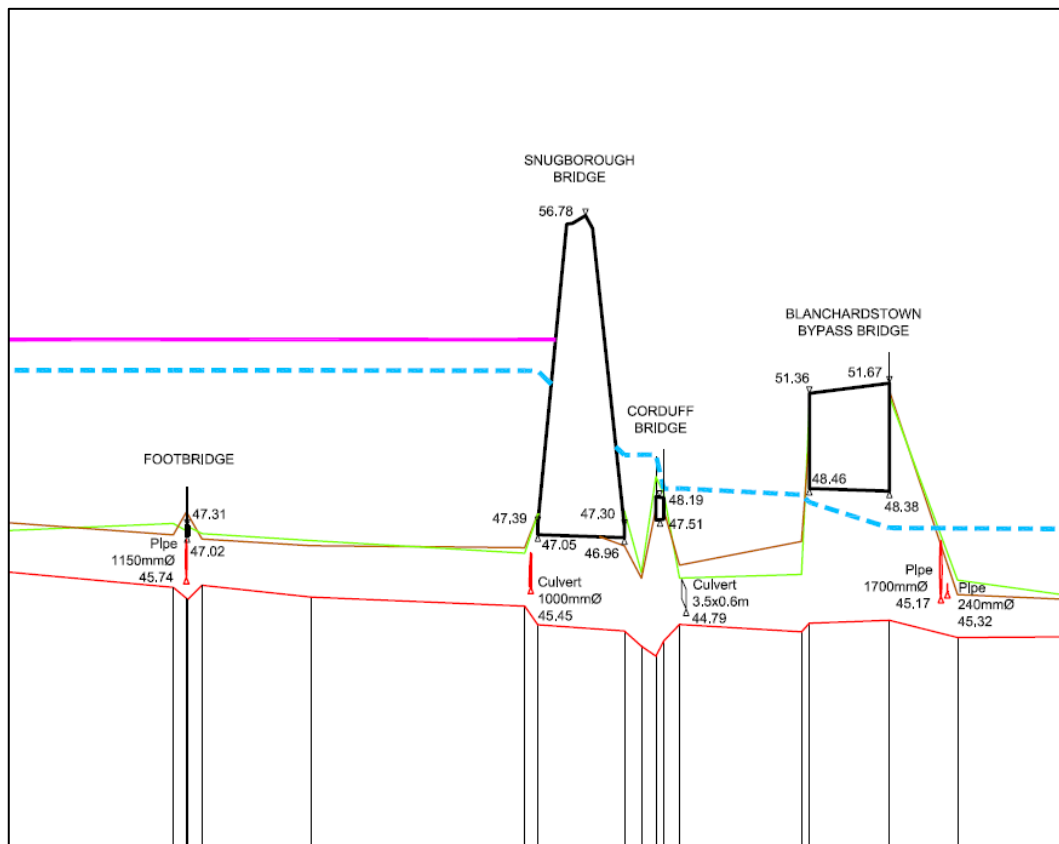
B35 Snugborough Road to BR_01 Tolka River Bridge, 1 in-100-year hydraulic grade line (extract from the River Tolka Flooding Study Final Report, proposed scenario)
